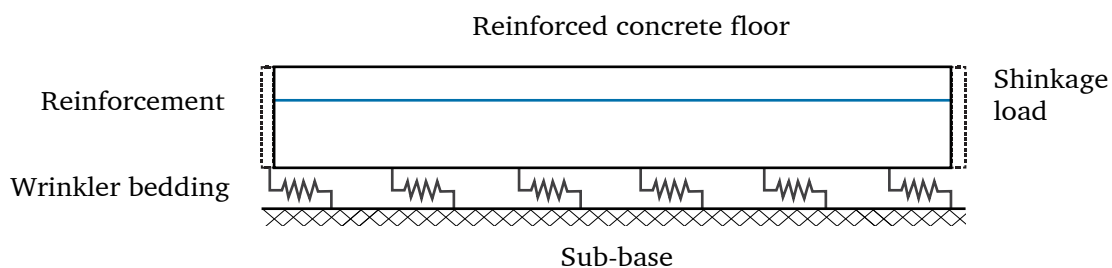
Mechanical scheme of concrete floor on a linear elastic bedding with reinforcement at 0.05 m from the top.
